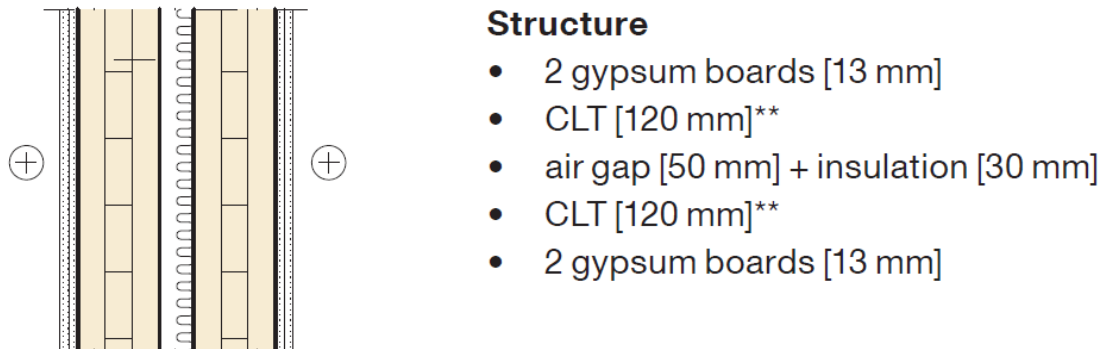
Commercial build-up CLT wall by StoraEnso
